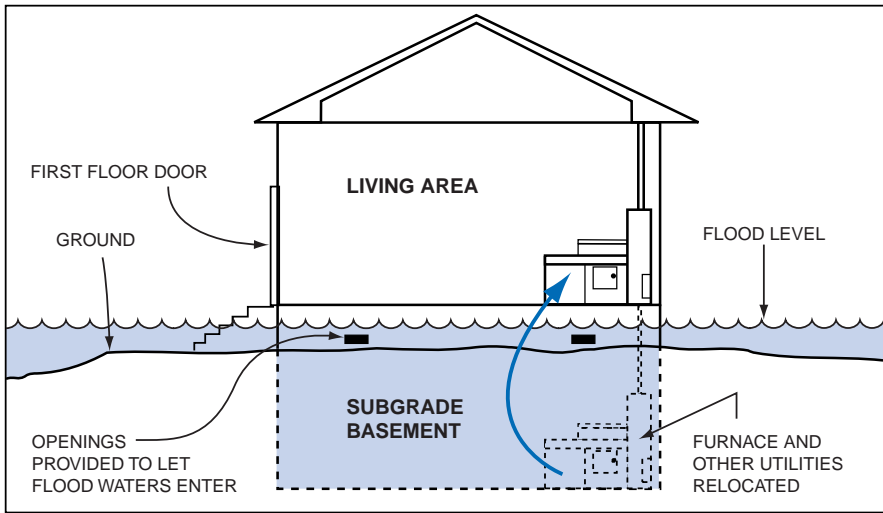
A house with a wet floodproofed subgrade basement. (If this house were substantially damaged or substantially improved, the basement would have to be filled in; see the Warning at right.)
